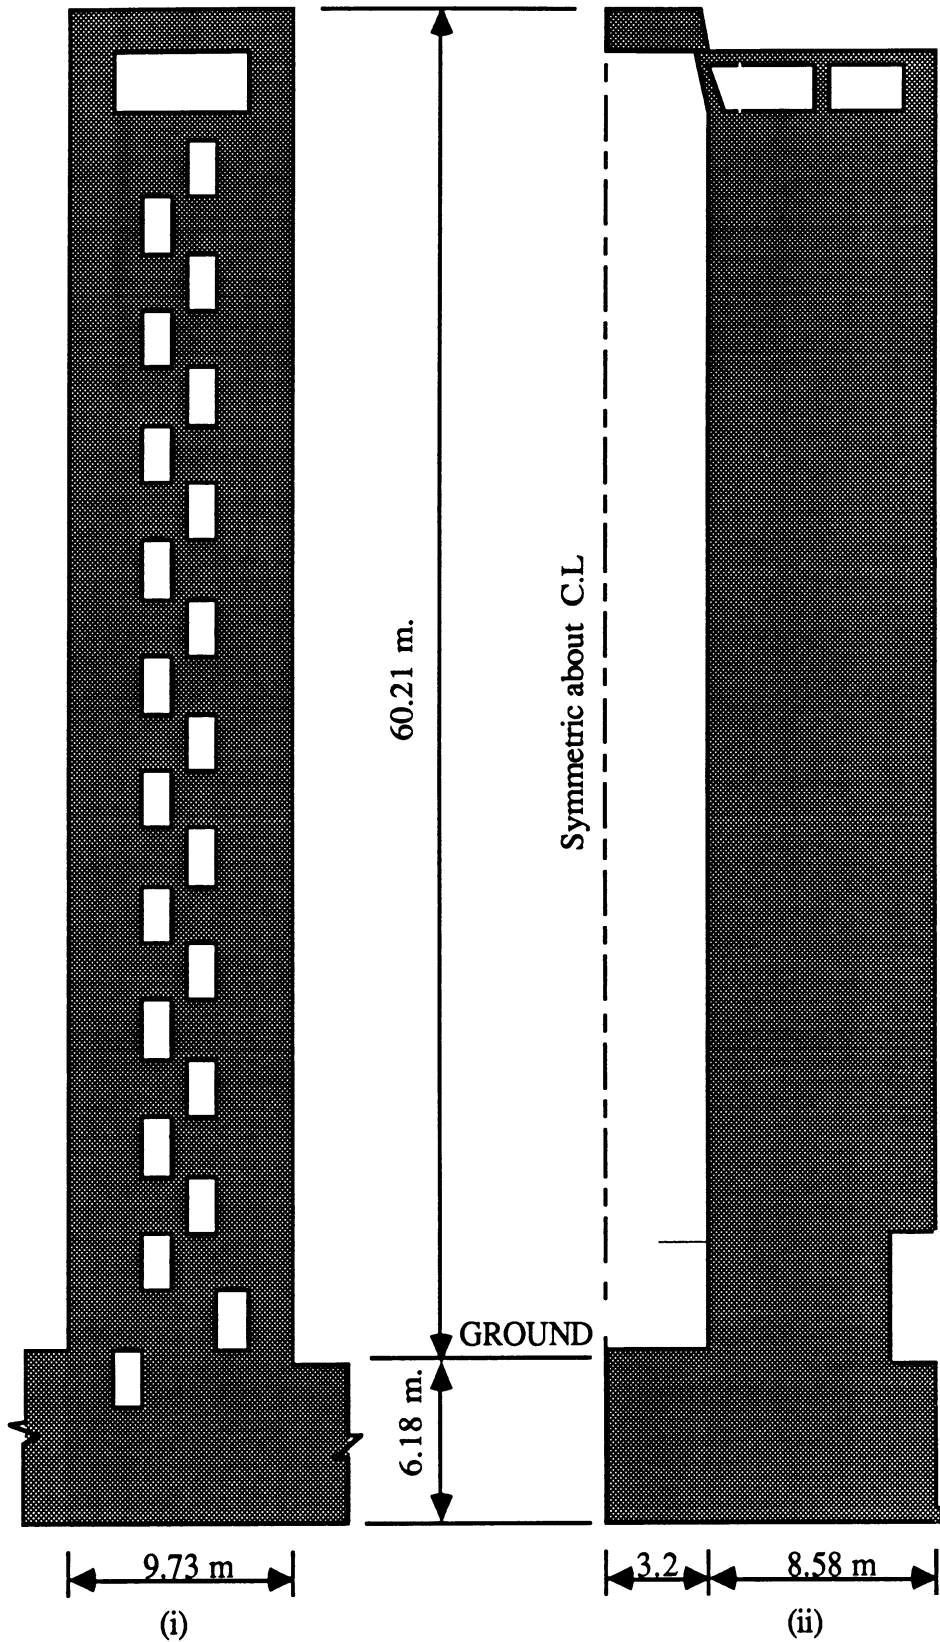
(b) : Elevations of Walls in Almendral Building along
